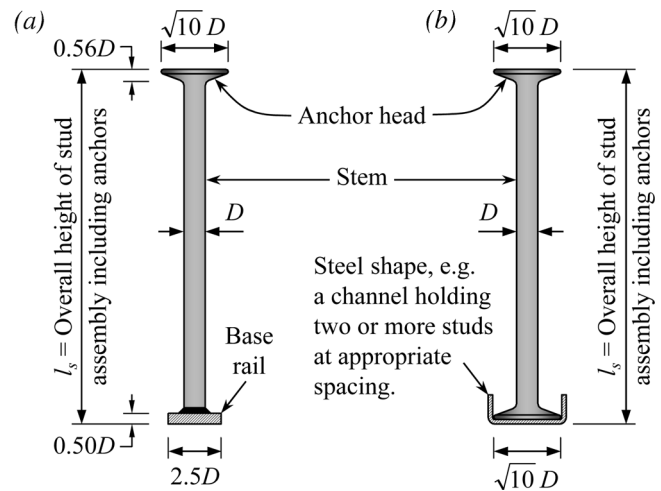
Stud assemblies conforming to ASTM A1044/A1044M: (a) single-headed studs welded to a base rail; and (b) double-headed studs crimped into a steel channel.
